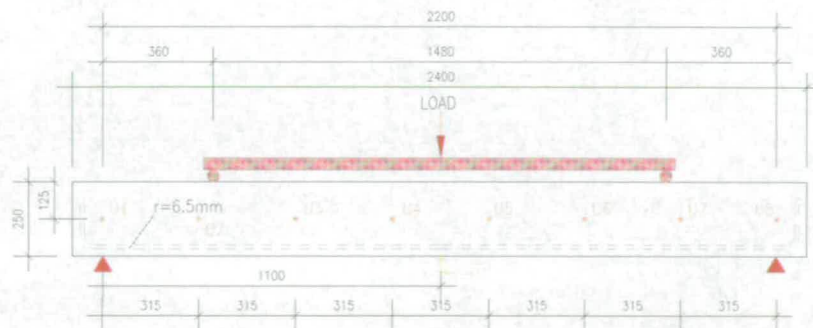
Design details, test configuration and broadband sensor location (UT-1000 type: U1 to U8) of beam KL2.
